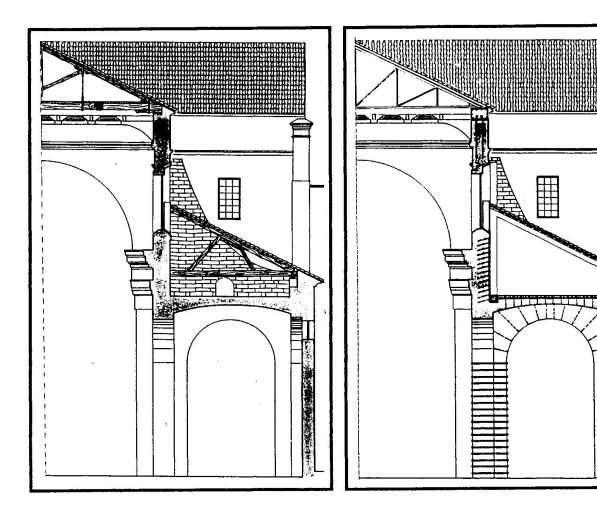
Cross-section of the right side aisle before structural rehabilitation
